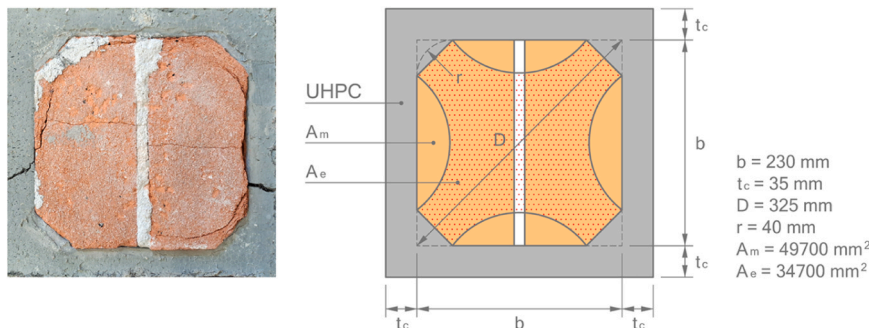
Example of a strengthened column exposed to 600°C after the compression test, and confinement scheme with UHPC jacket.
